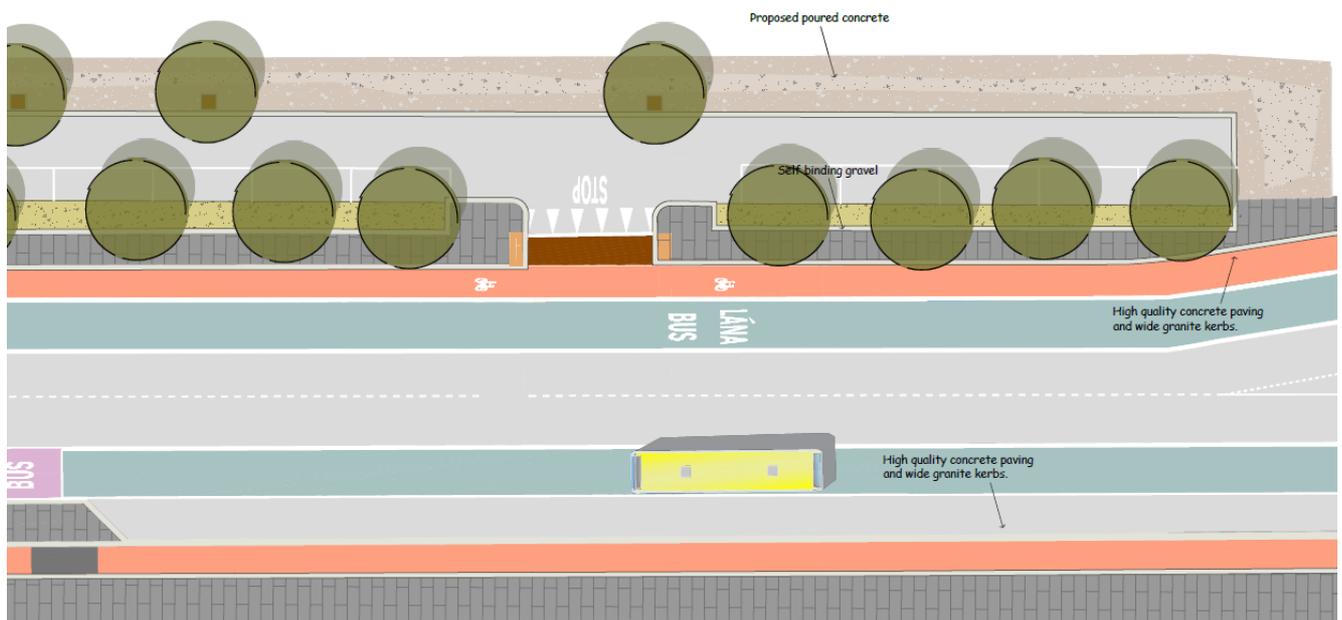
House No. 352 to No. 340 Ballyfermot Road
